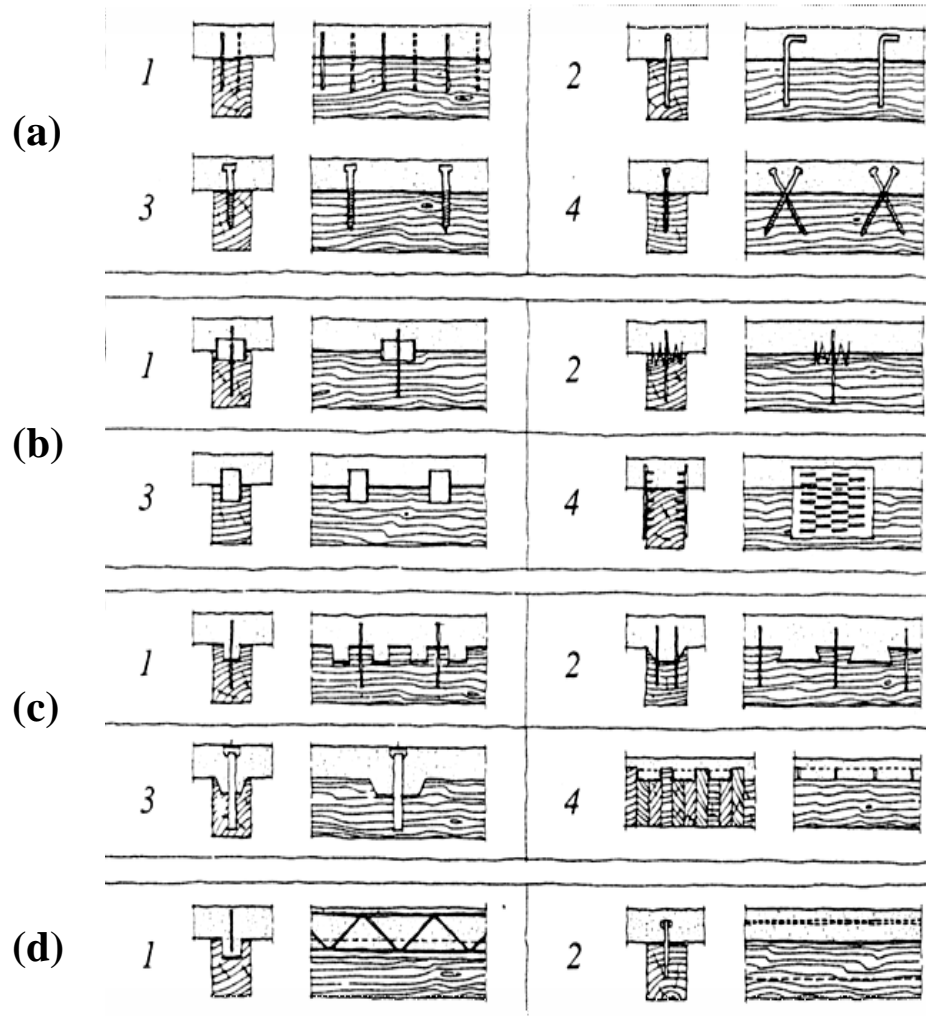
Examples of timber-concrete interlayer connections: (a1) nails; (a2) reinforcement bars, glued; (a3/4) screws; (b1/2) split rings and toothed plates connectors; (b3) steel tubes; (b4) steel punched metal plates; (c1) round holes in timber and fasteners preventing uplift; (c2) square indentation and fasteners; (c3) cup indentation and prestressed steel bars; (c4) nailed timber planks deck and steel shear plates slotted through the deeper planks; (d1) steel lattice glued to timber; (d2) steel plate glued to timber. (Ceccotti, 1995)
